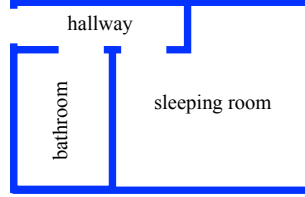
Haptic-audio floor plan employed in the training section of Study I.
